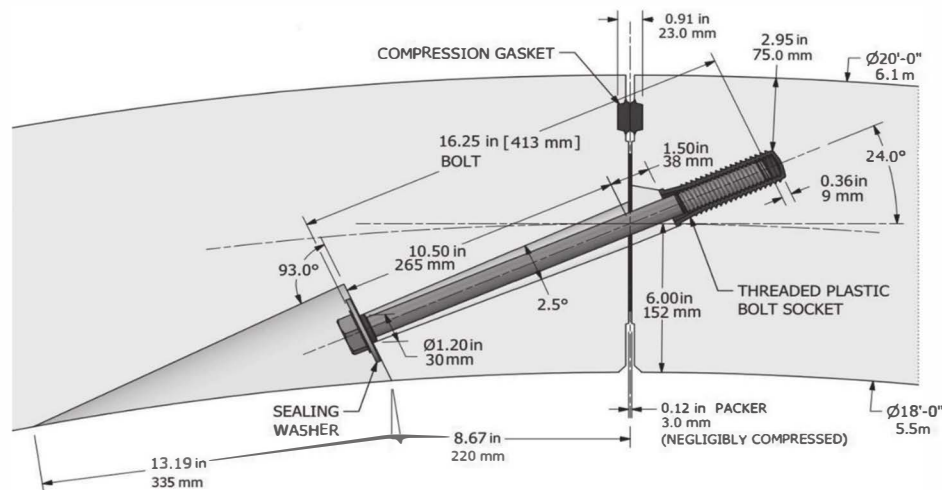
Typical detail of bolt connection in longitudinal joints.
